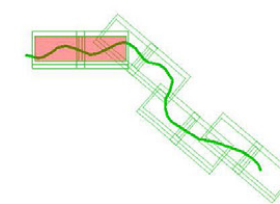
Urban and landscape design plan - Sheets 1 and 2 (Scale 1:8000)
